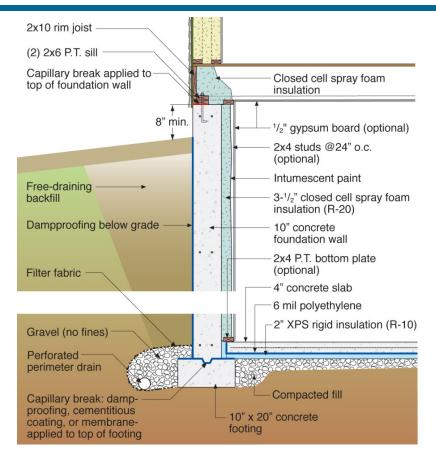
Foundation wall with 31/2 in. of ccSPF insulation
